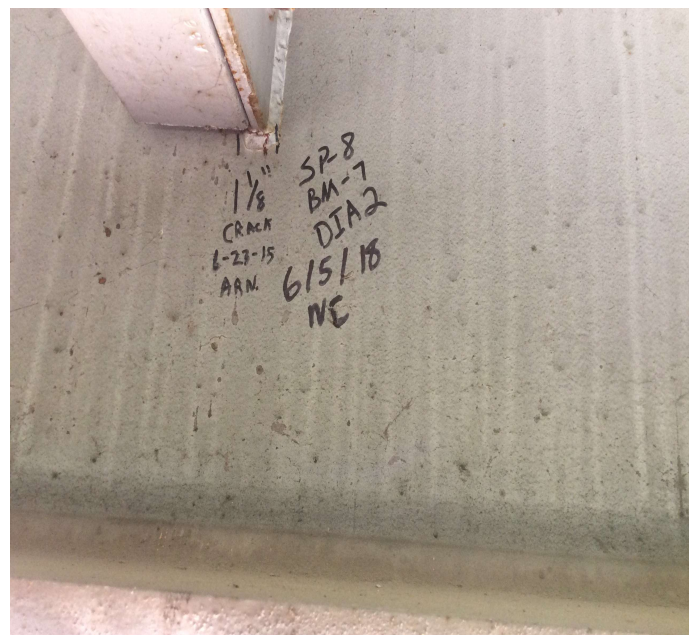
Description Span 8 beam 7 diaphragm 2 crack in toe of weld.
